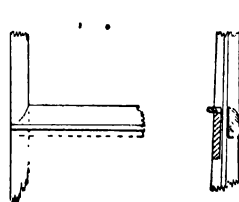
Another Plain Type Eliminating Detail Panel Work.
